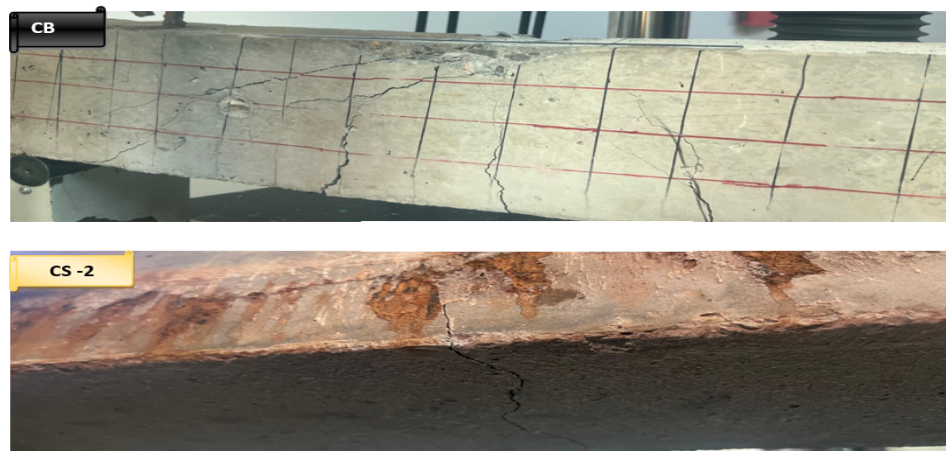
(a) Failure in tension zone (b) Cracked shear zone/wider cracks
